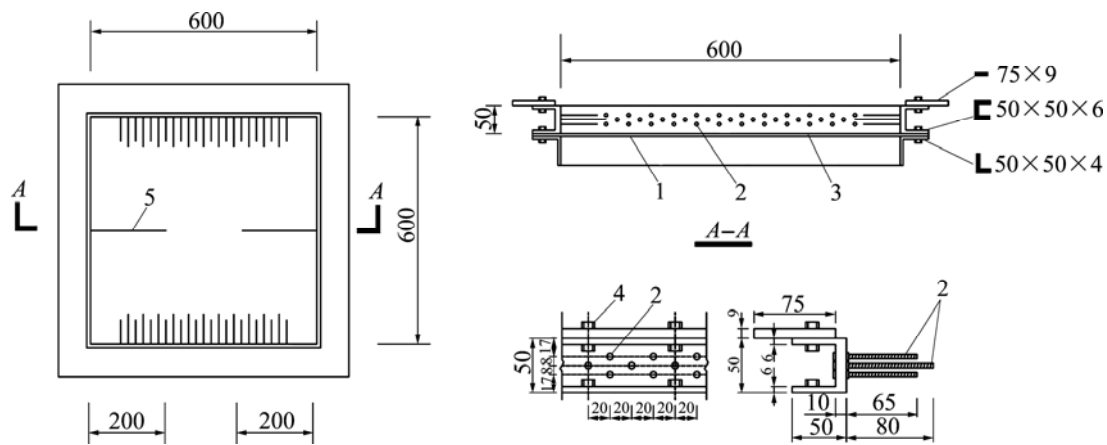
Details of modified flat-type specimen (unit: mm): 1—Motherboard; 2— $d6$ Bolt; 3—Olefin paper, teflon paper; 4— $d9$ Bolt; 5—Steel plate
